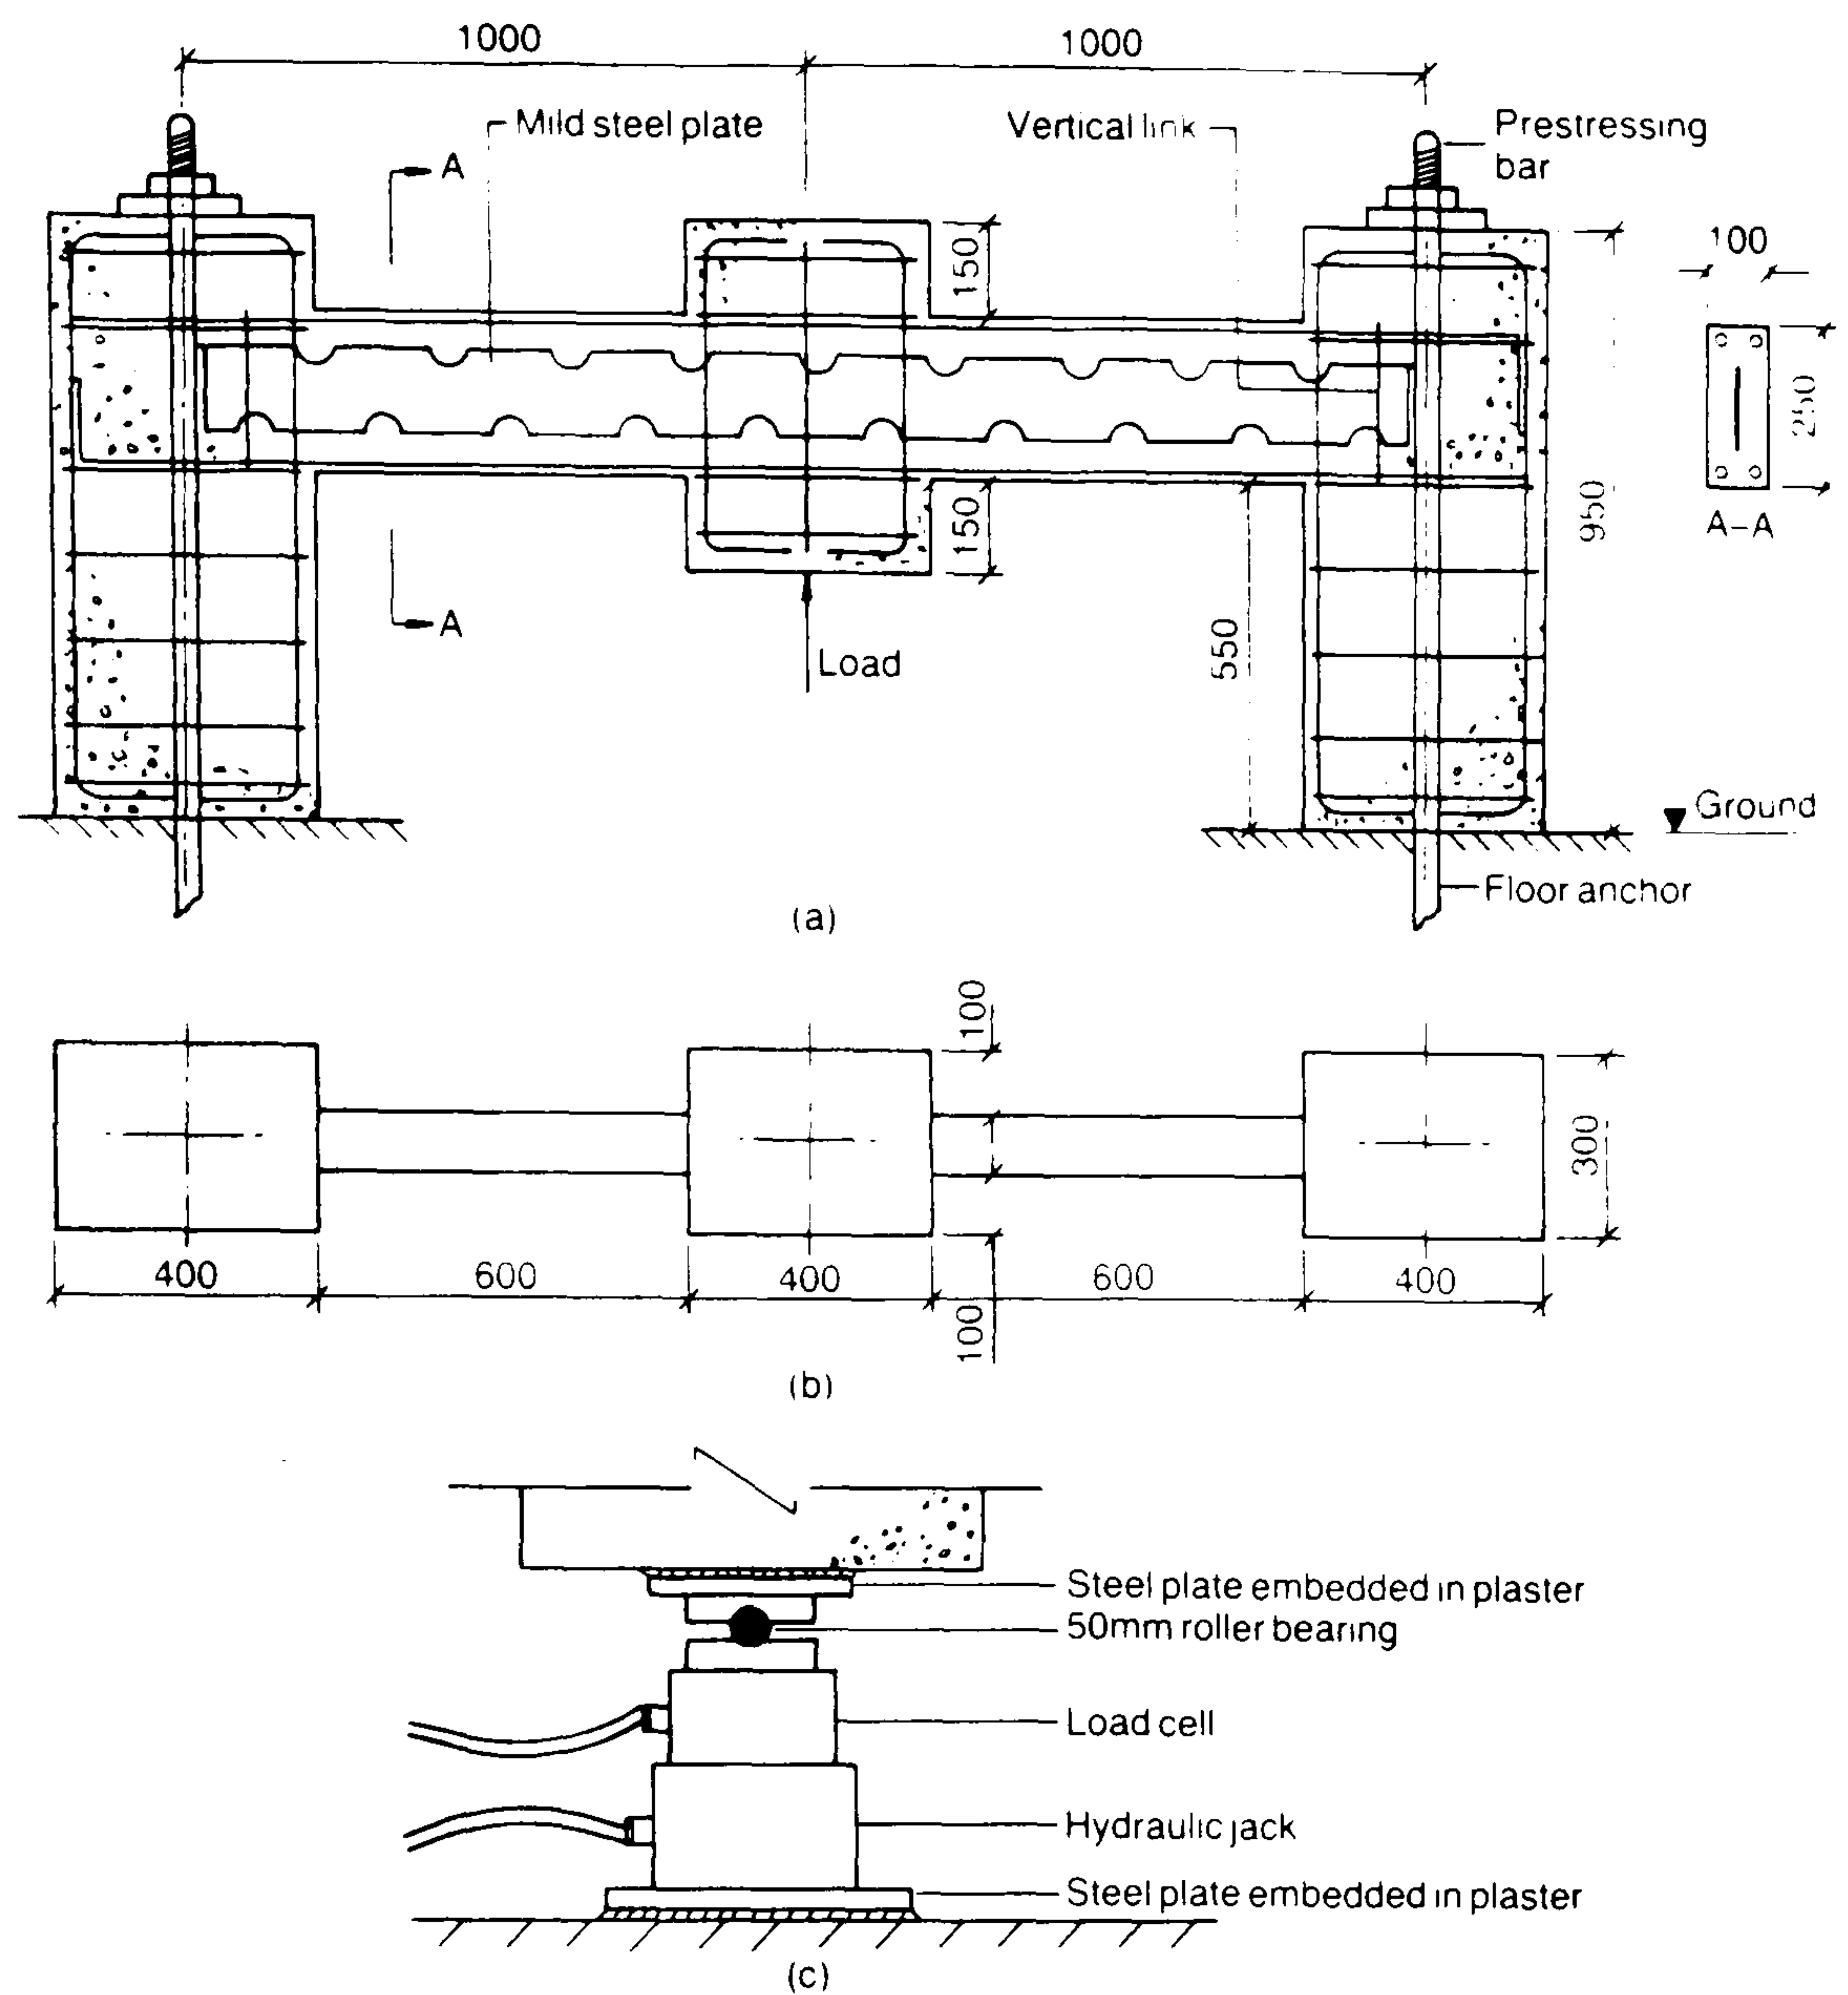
Detail of the test beams: a) longitudinal section; b) plan; c) loading arrangement. Subedi [2]
